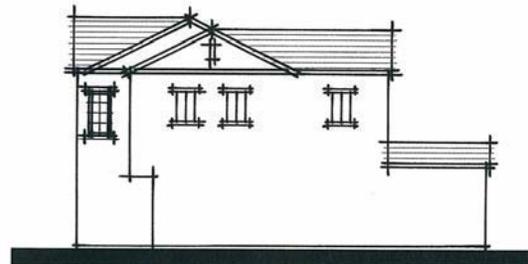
Plan 2 – Normandy Elevations
